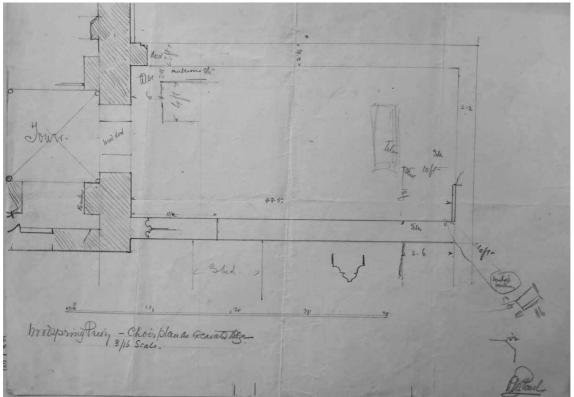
Paul's sketch plan of the excavated site of the choir, 1885
